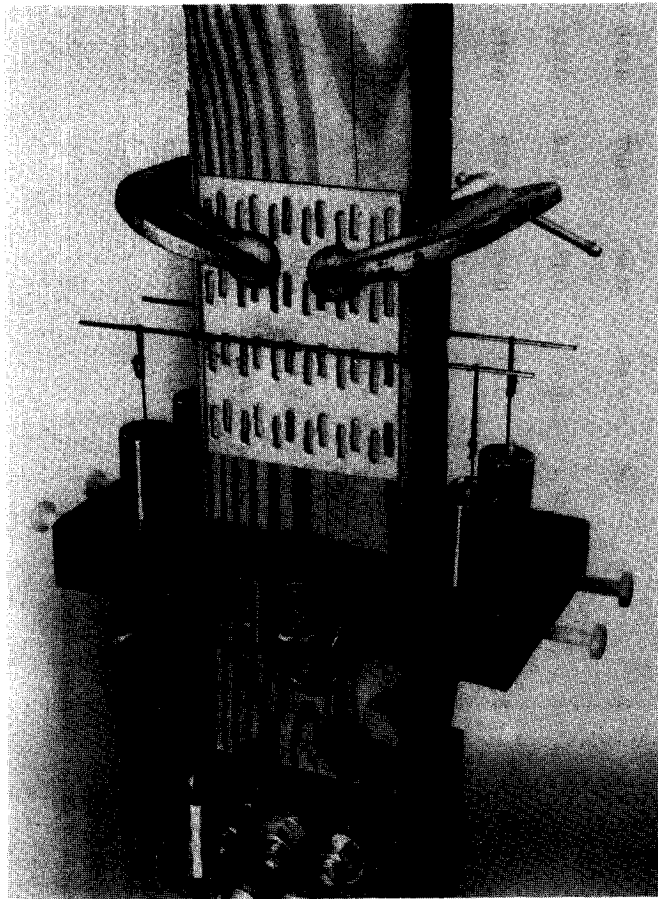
Typical metal-plate connector joint specimen before tensile testing.
